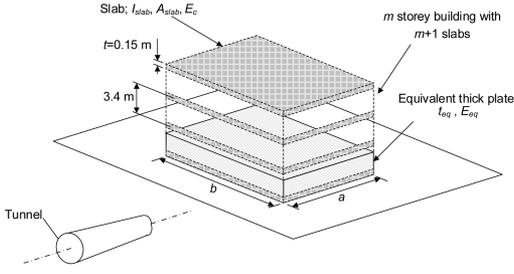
Excavation of tunnel under m storeys building and equivalent thick plate.
